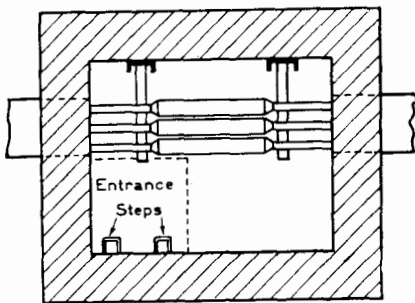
PLAN OF OLD TYPE OF MANHOLE.
